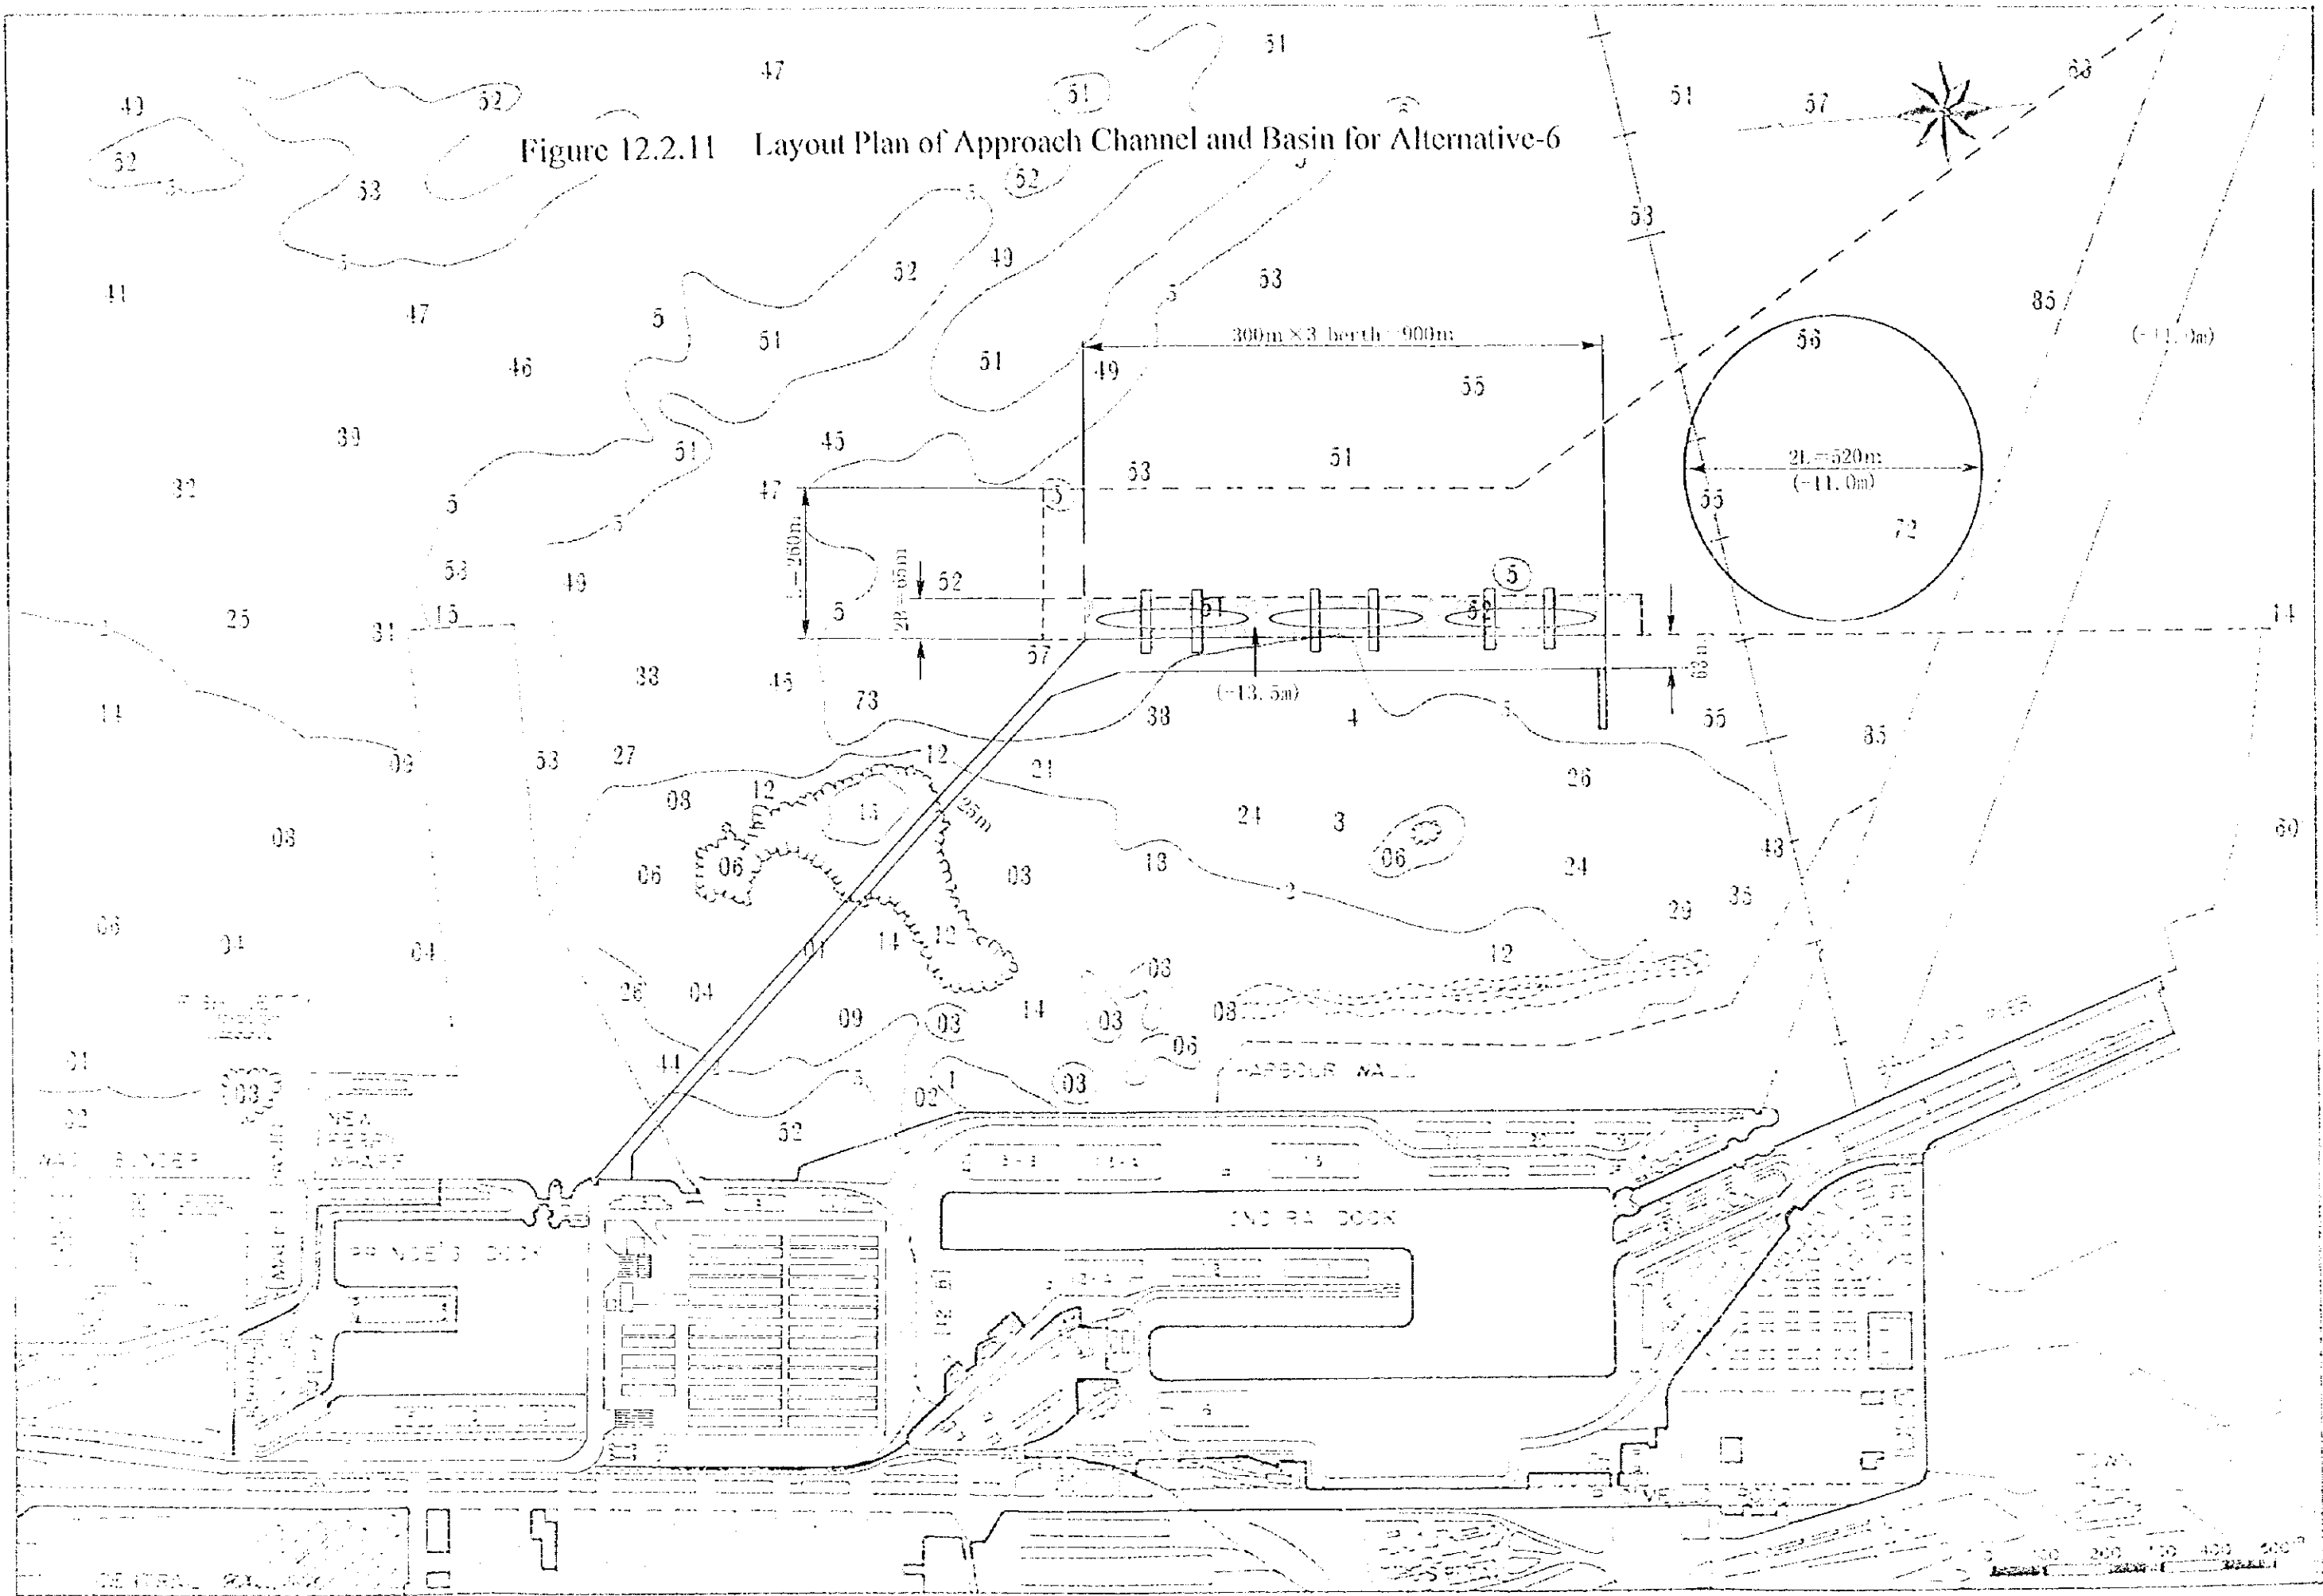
Layout Plan of Approach Channel and Basin for Alternative-6
